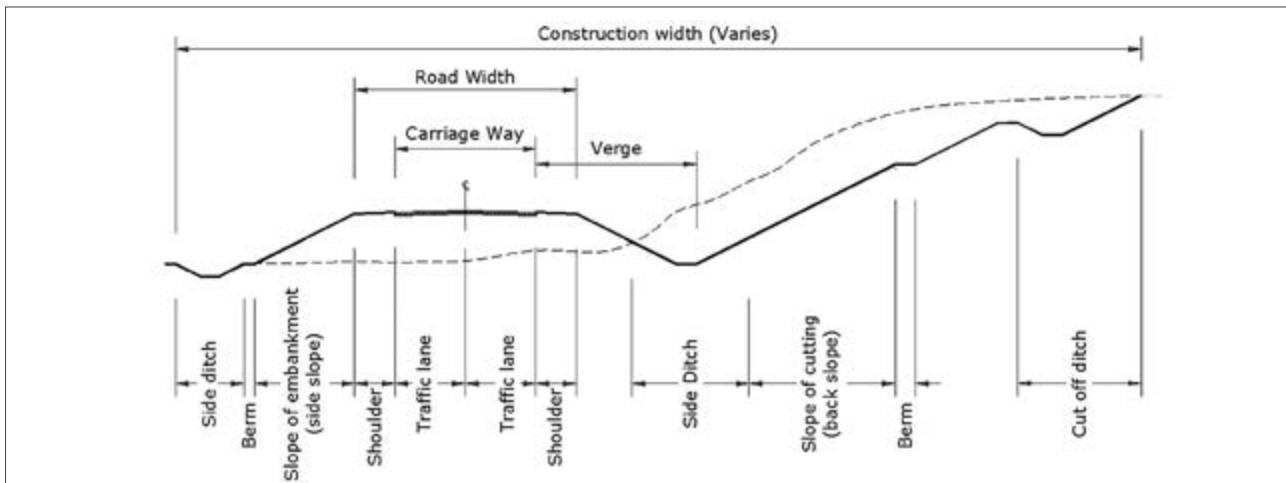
Illustrations of Standard Terms Used for the Cross-sections for Dual Carriageway Roads
